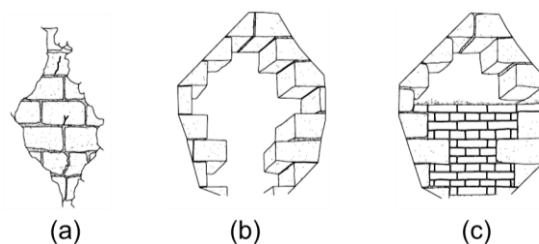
“Scuci-Cuci” procedure: (a) damaged portion of masonry wall, (b) removal of damaged stones and (c) filling with new masonry (adapted from EU-India cross program, 2006).
